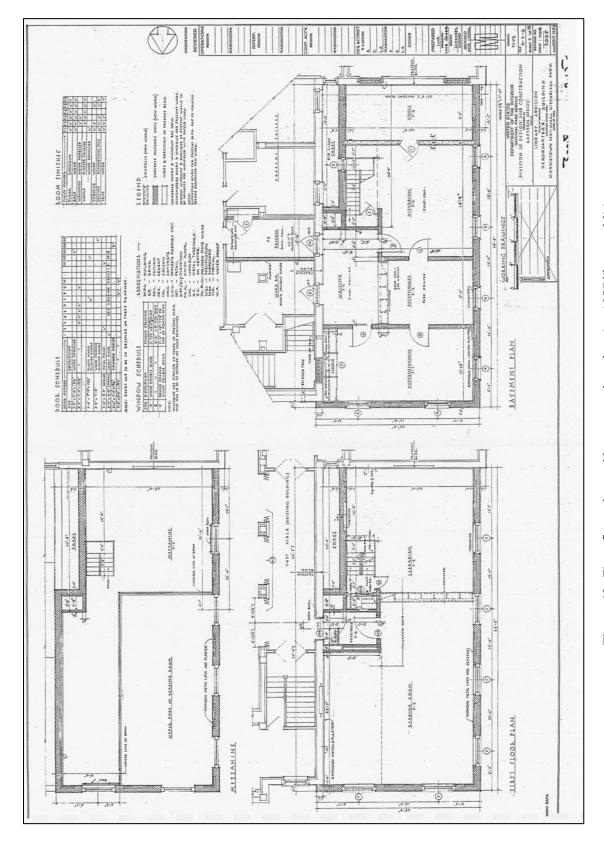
First-floor plan and basement plan, showing 1957 library addition.
